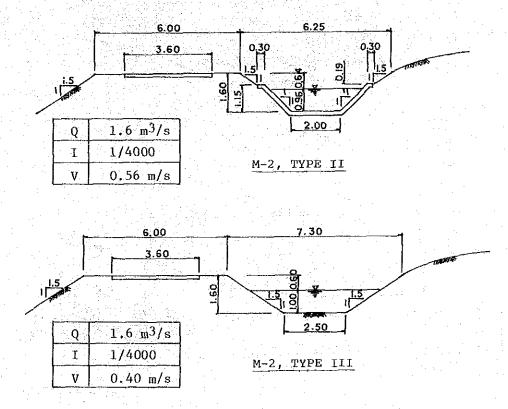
TYPICAL SECTIONS OF MAIN & BRANCH CANALS
